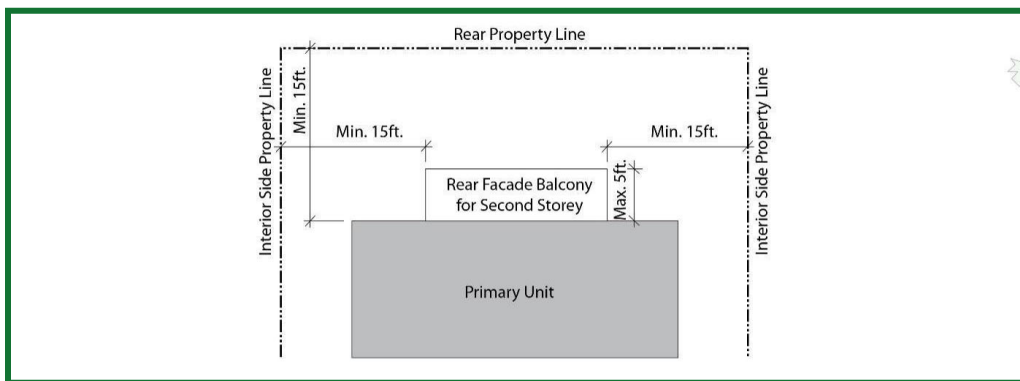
B-2: BUILDING ARTICULATION - RS DISTRICTS
